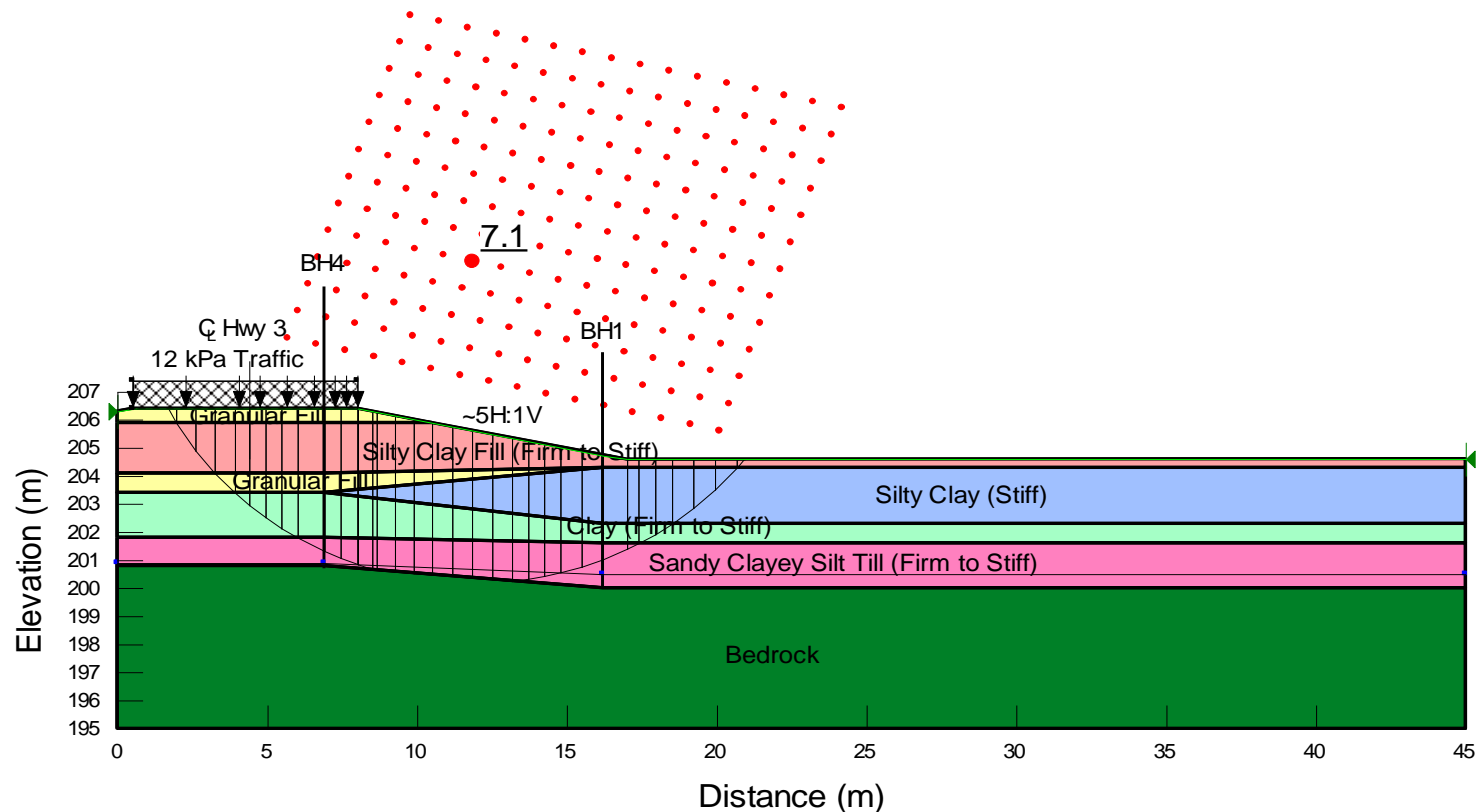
Slope stability analysis for embankment slope – undrained static conditions
